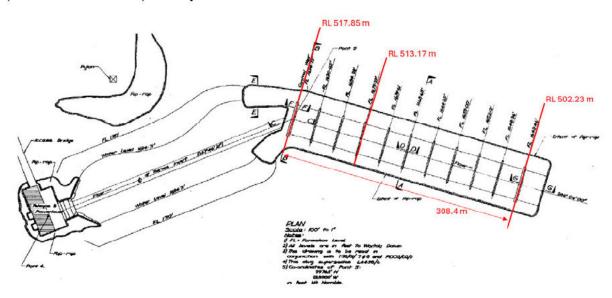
Plan view showing the Tekapo B Power Station (left) and the tailrace weir (right) with reduced levels.
